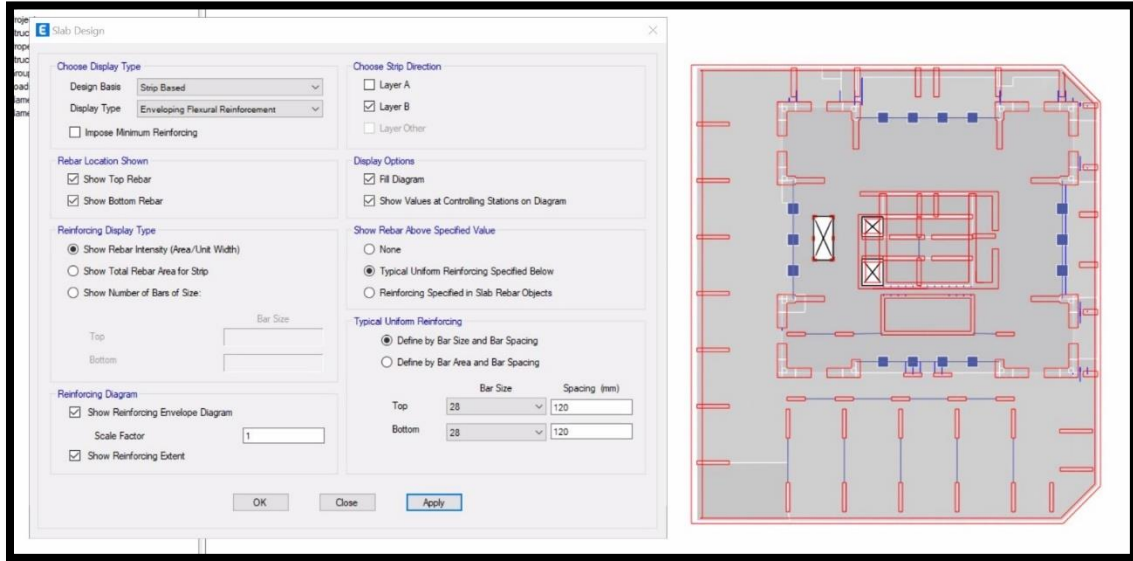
Odd Zones Reinforcement in Y-Direction for Ground Floor
